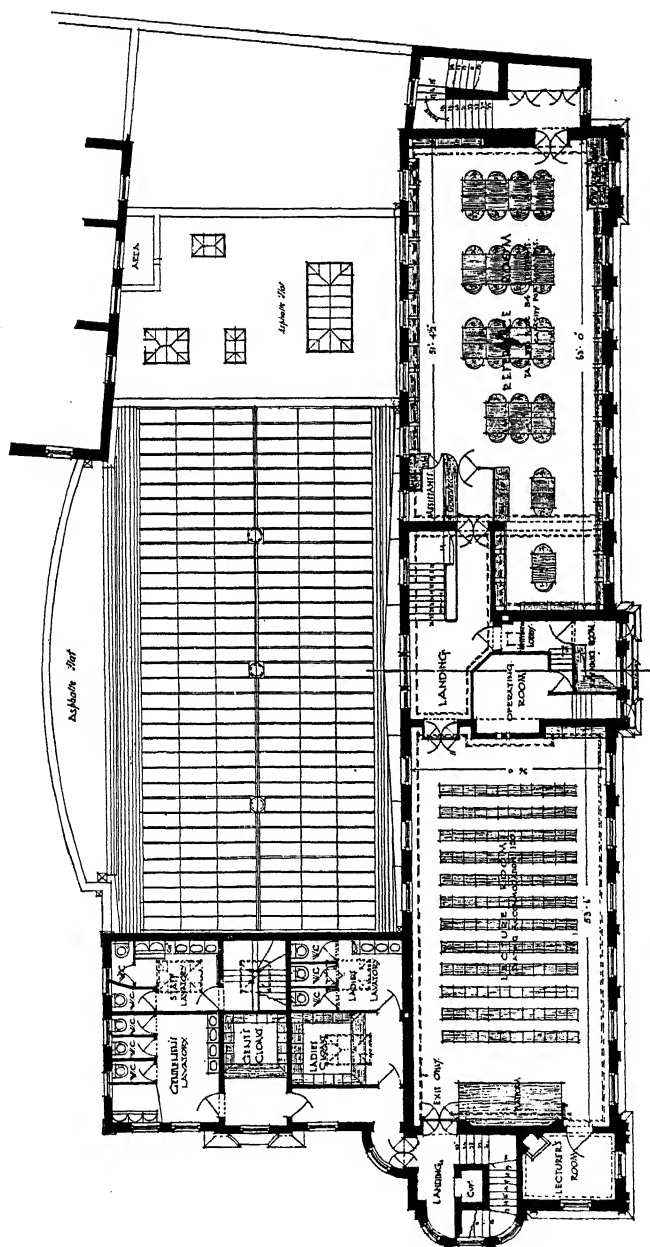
Bethnal Green Library, First Floor Plan (Section 174).
